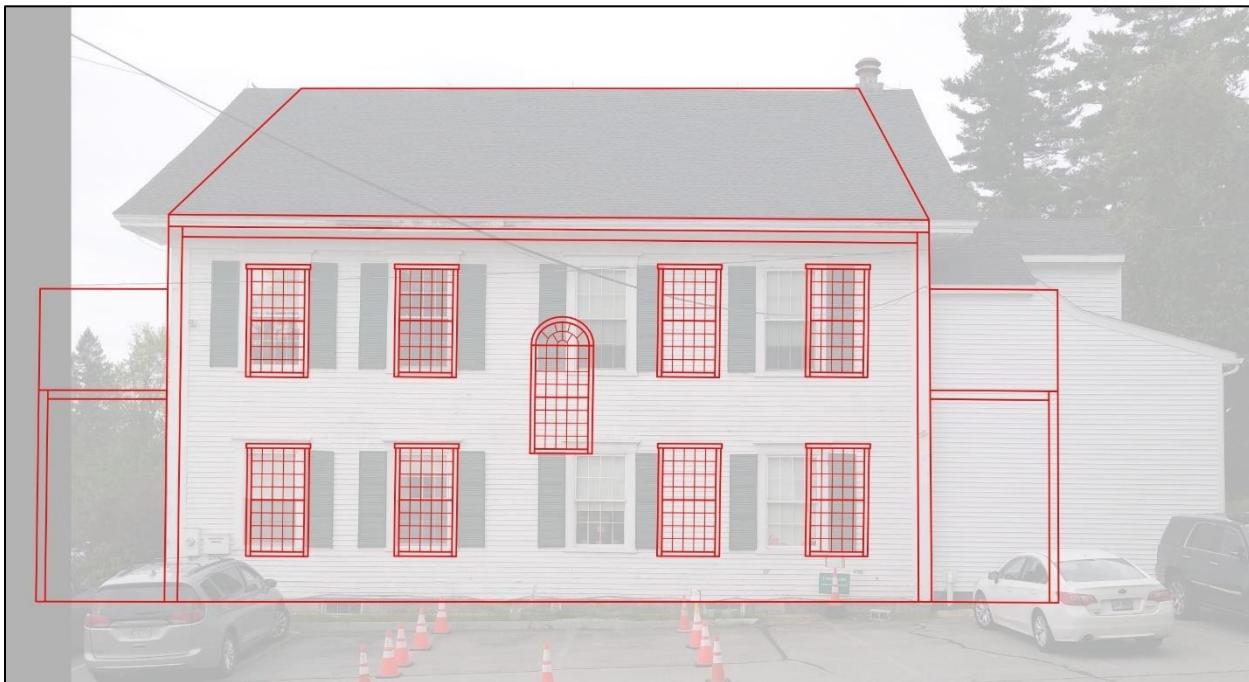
Conjectural Drawing of North Elevation of Windham Meetinghouse, ca. 1800, superimposed on modern Town Hall
